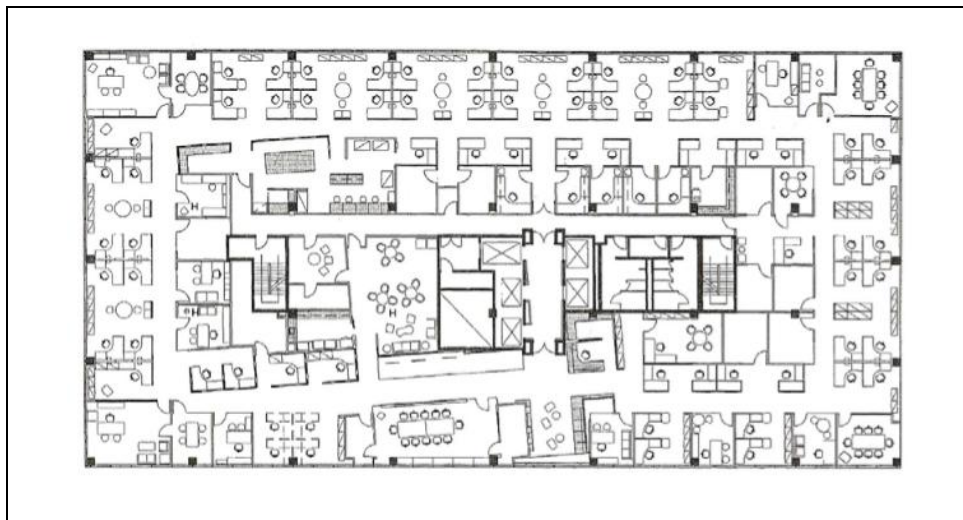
An example for a mixed office floor plan, Campbell-Ewald West Building
